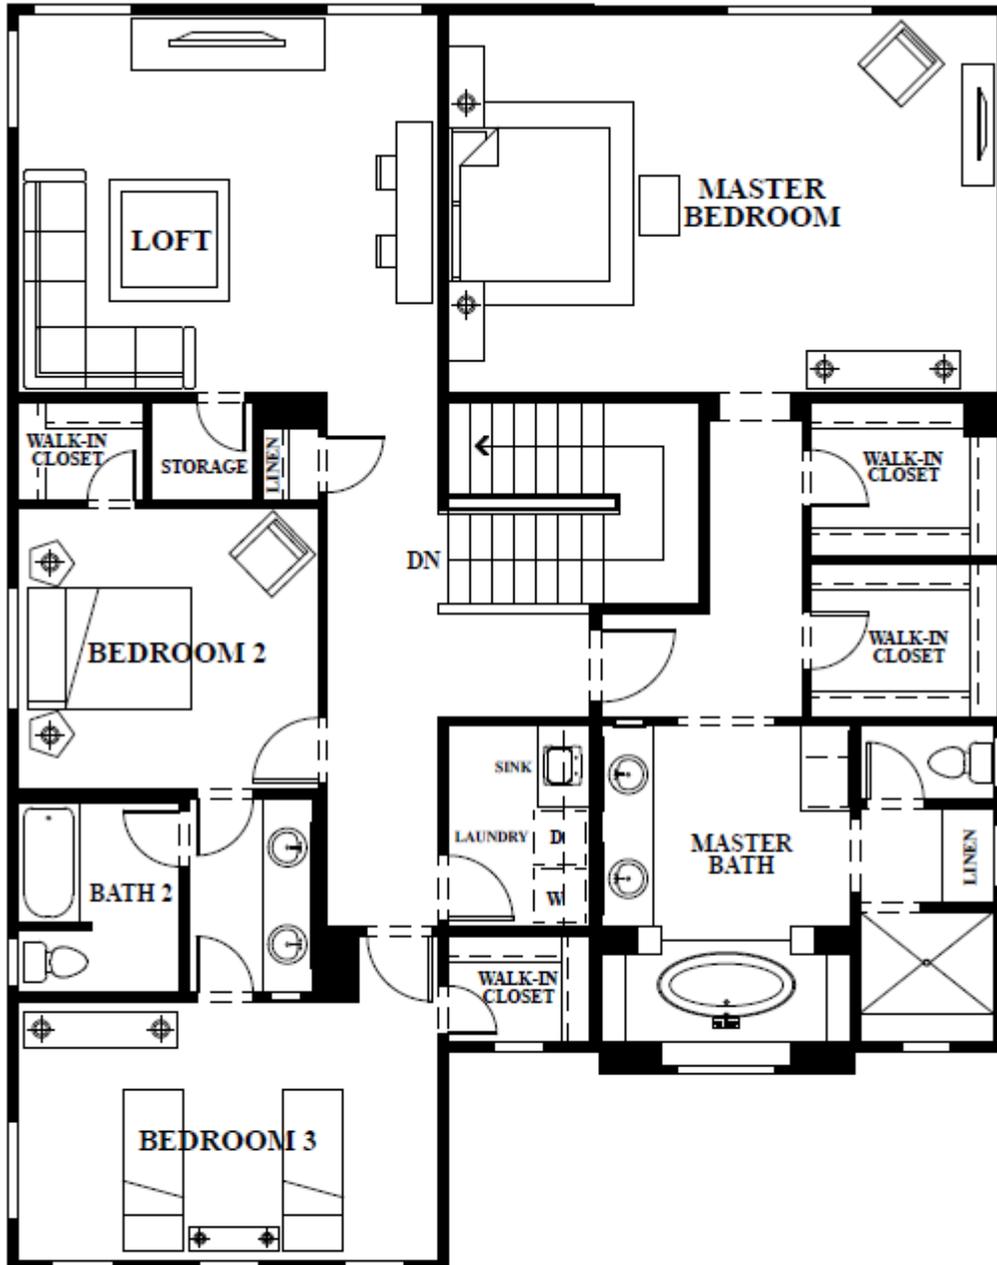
Exhibit C: Conceptual Site Plan/Floor Plan/Elevations
